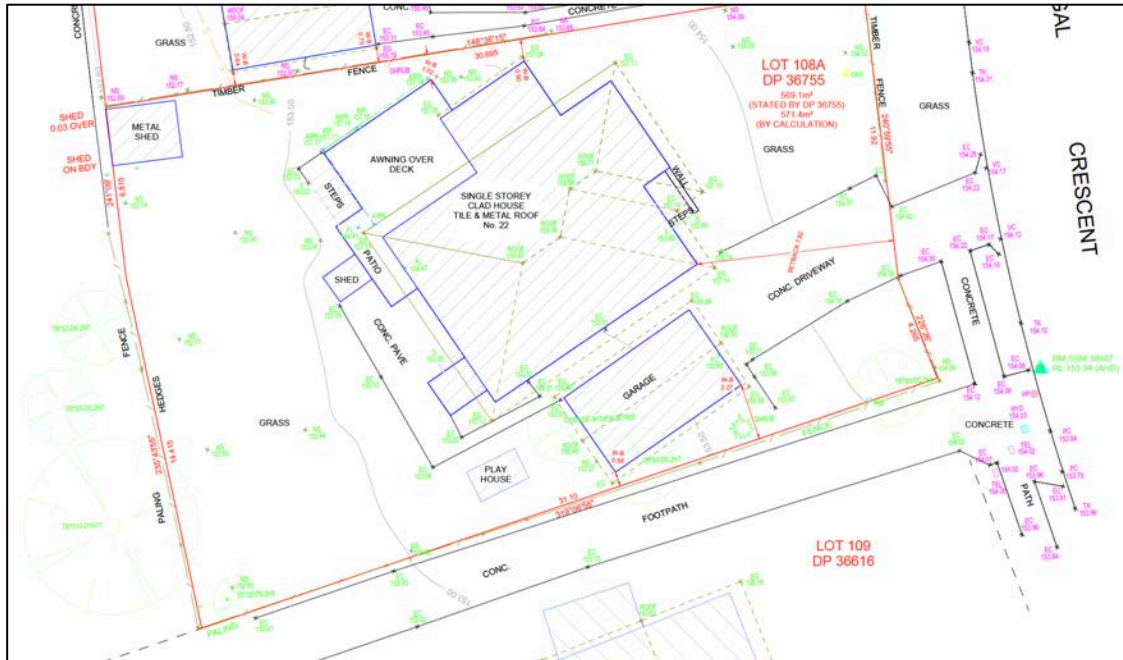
The existing layout. (Source: Detail and Boundary Survey of 22- 28 Karingal Crescent by C&A Surveyors, V2, dated 24/01/2023).
